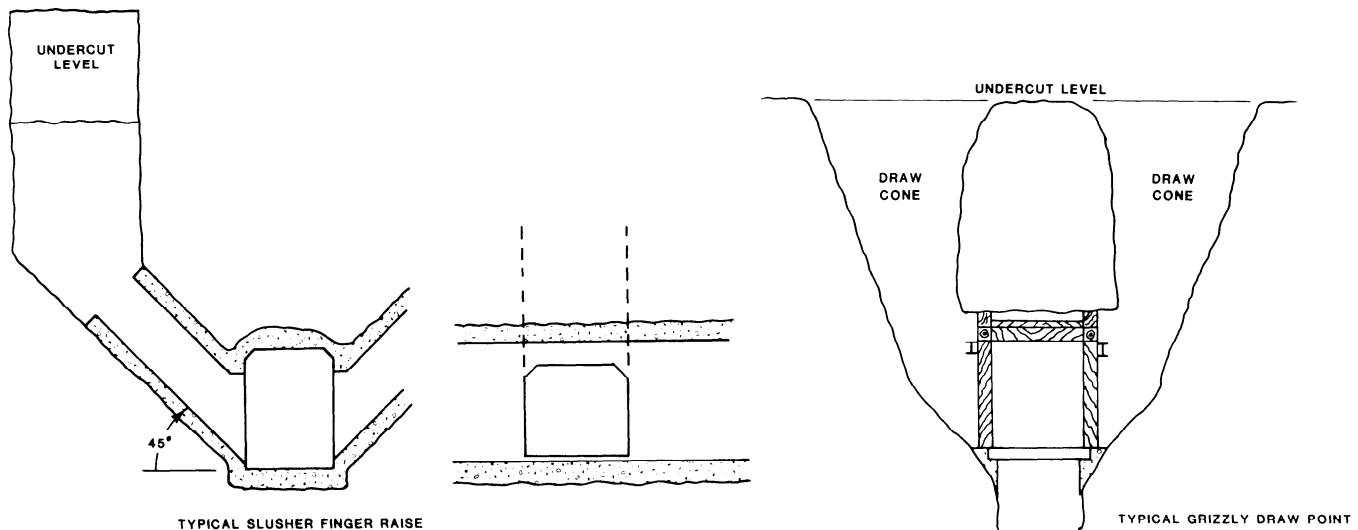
Drawpoint design—slusher and grizzly.
